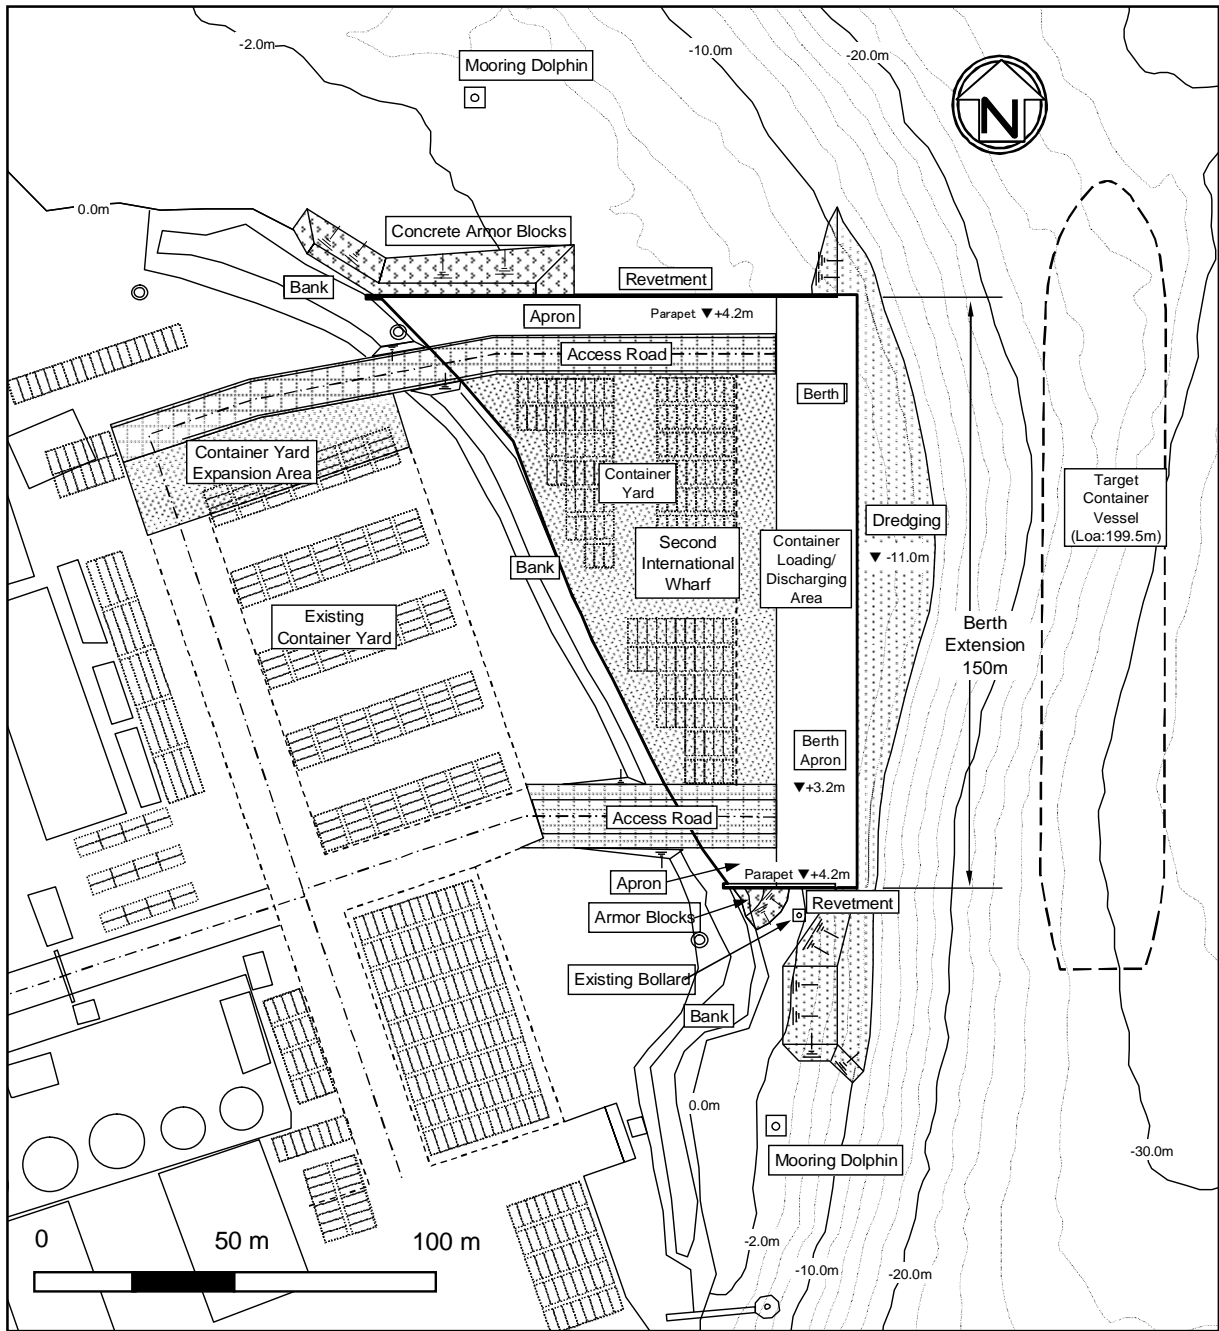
Brief Layout Plan of New International Wharf
